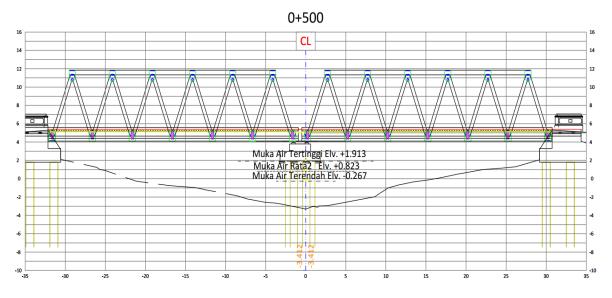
Existing cross section of Kuala Samboja bridge (STA 0+500)
